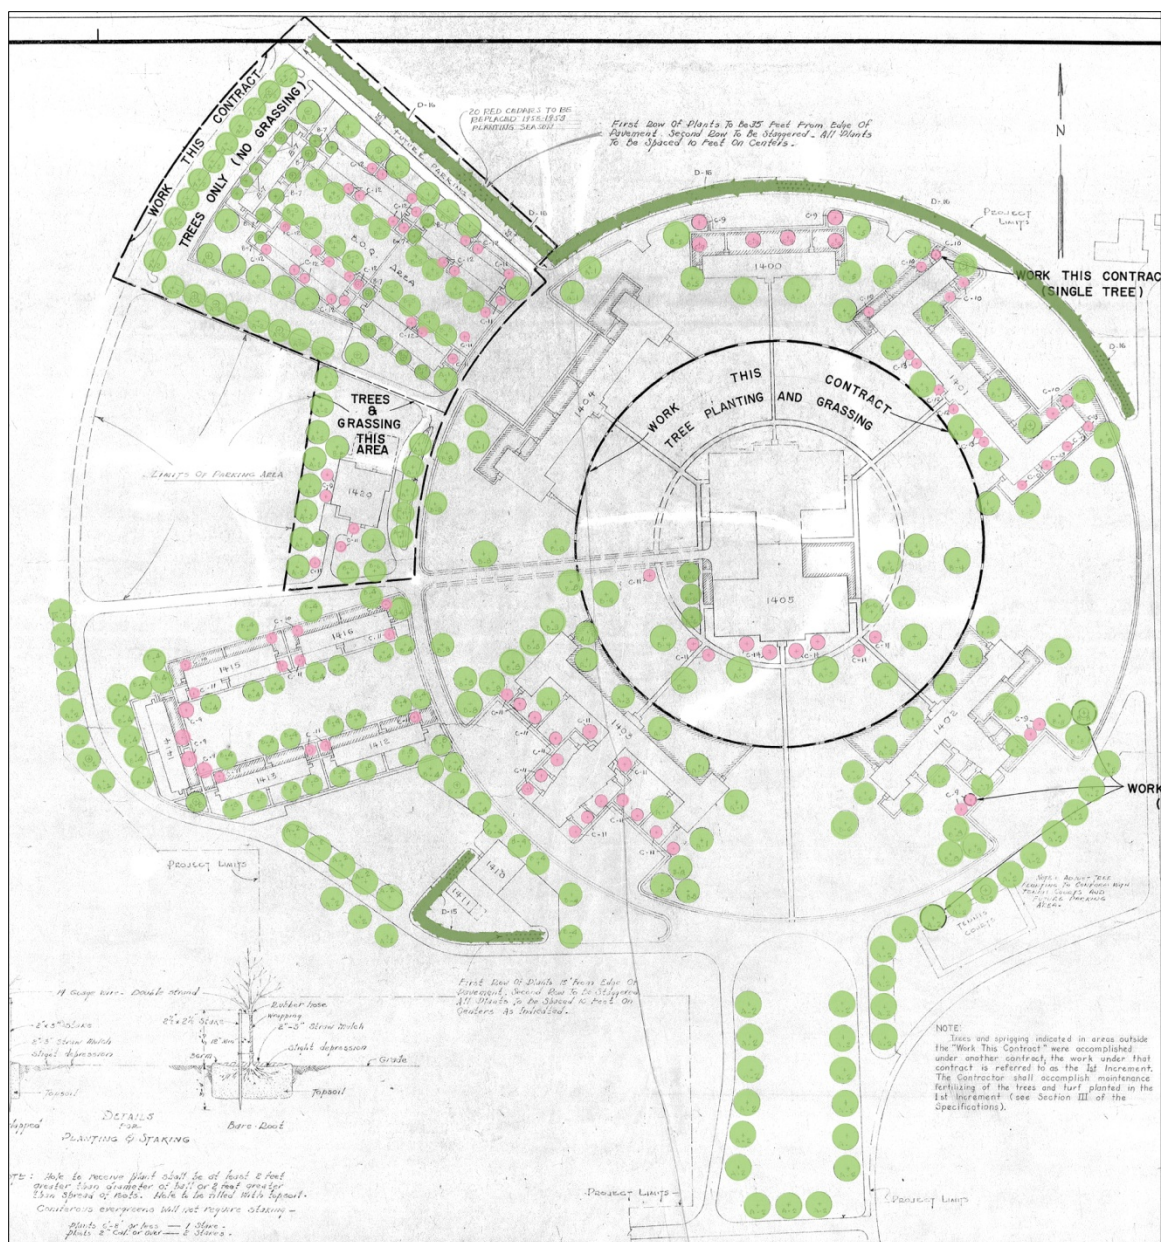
Area 1400 planting plan in 1952 (Maxwell AFB Cultural Resources).
